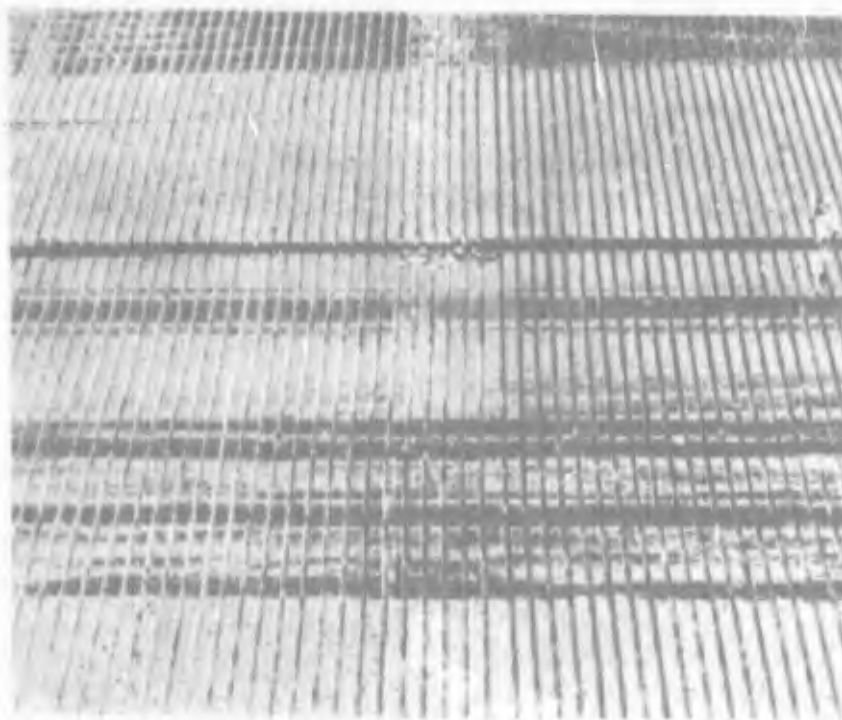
Minor spalling at joint which occurred during grooving
